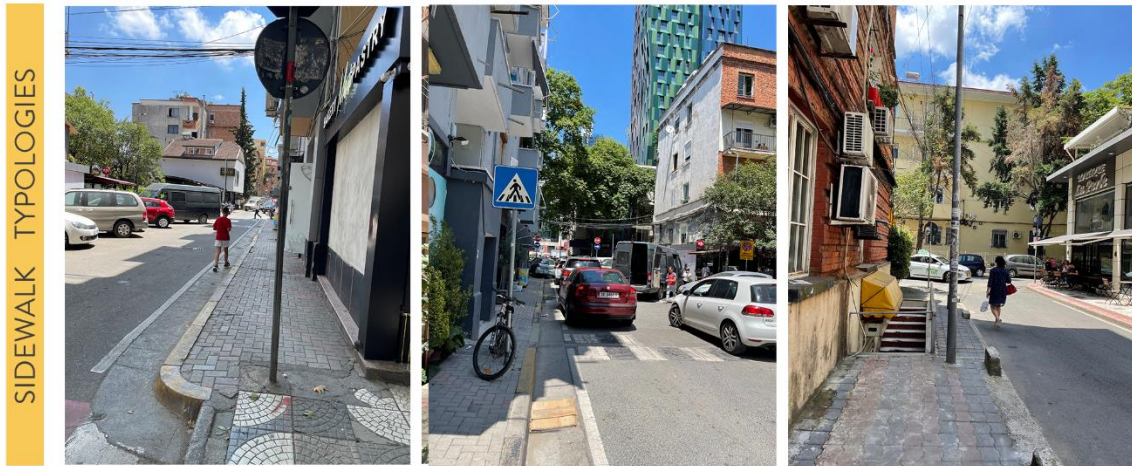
Existing conditions of sidewalks situated near “Dora D’Istria” primary school including obstructions, insufficient width, and disconnections.
